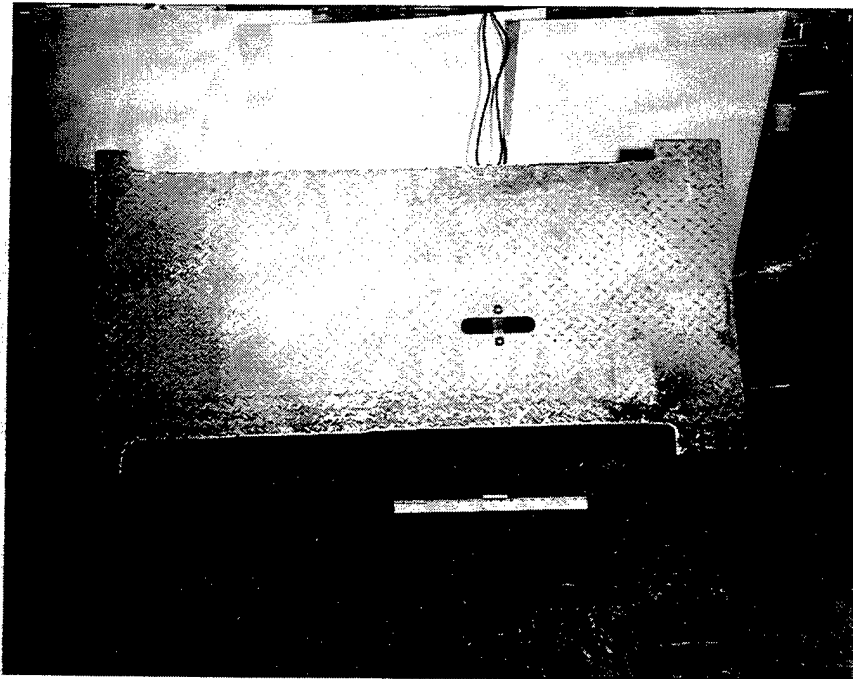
Top view of the surface deck of the test section in Figure 69. See the rolled raised figure for skid resistance on the surface. Note the lifting bar bolted underneath the oblong hole in the aluminum floor plate.
